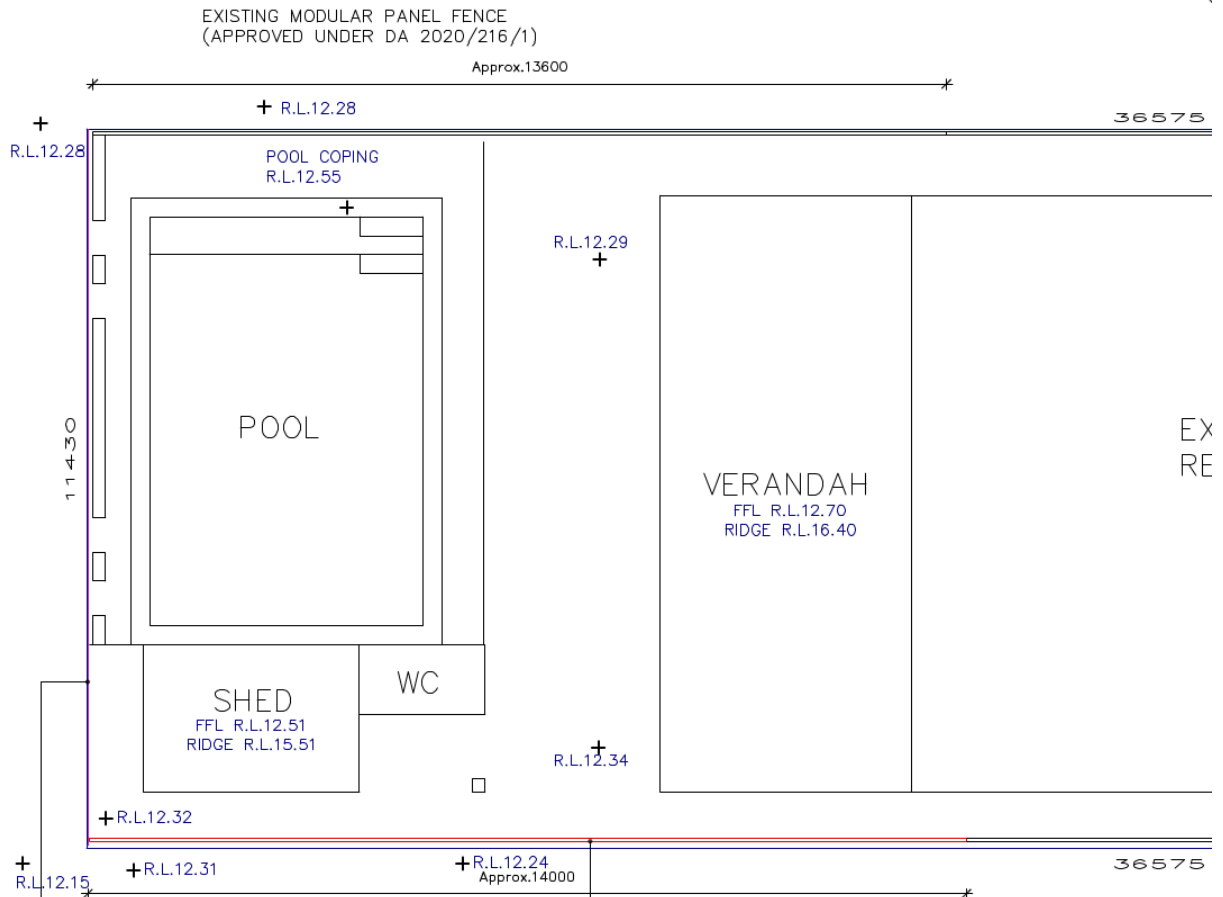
Extract of the proposed site plan showing the rear part of the property.
